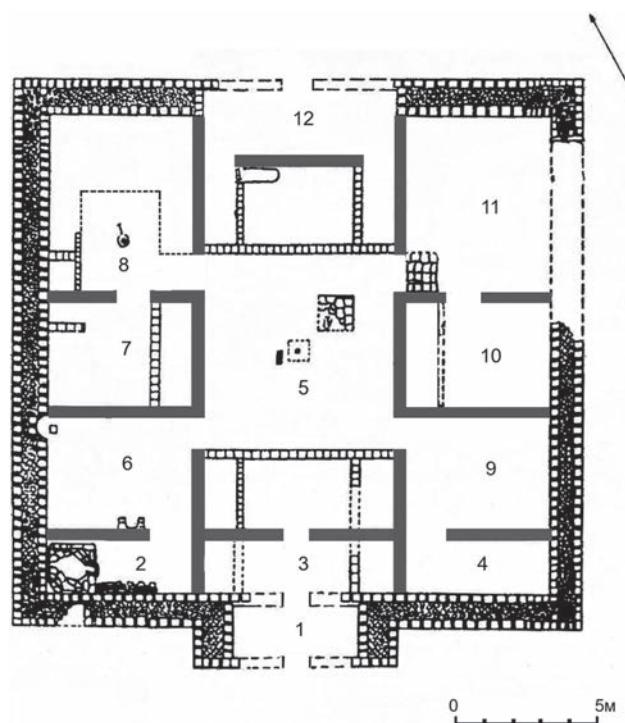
Building in Bayildir, plan with elements of reconstruction
